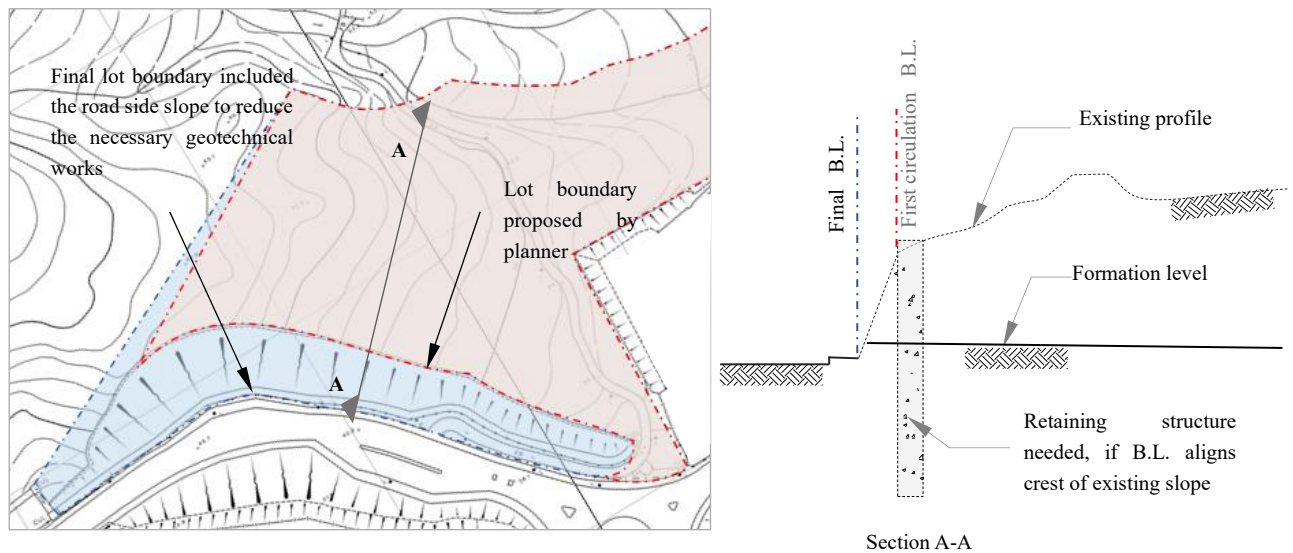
Smarter planning of the site layout and lot boundary to minimize the geotechnical works necessary for the development
